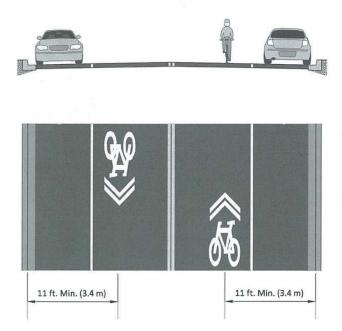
Typical Shared-Lane Marking Cross Section on Street with Parking
